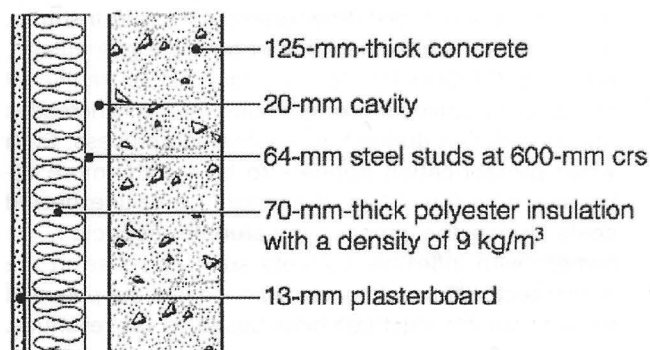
Example of an insulated concrete wall system (Cement and Concrete Association of Australia, 2005.)
